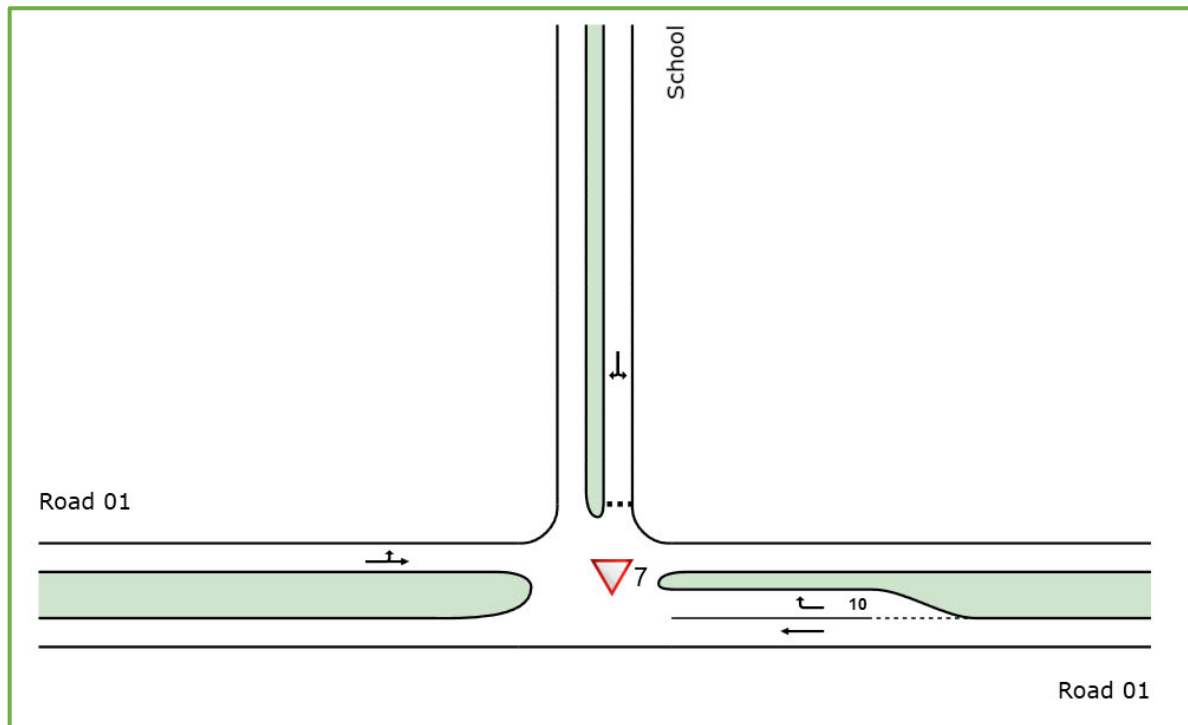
Proposed School Access / Road 03 Intersection Layout (Based on Calibre Report)
